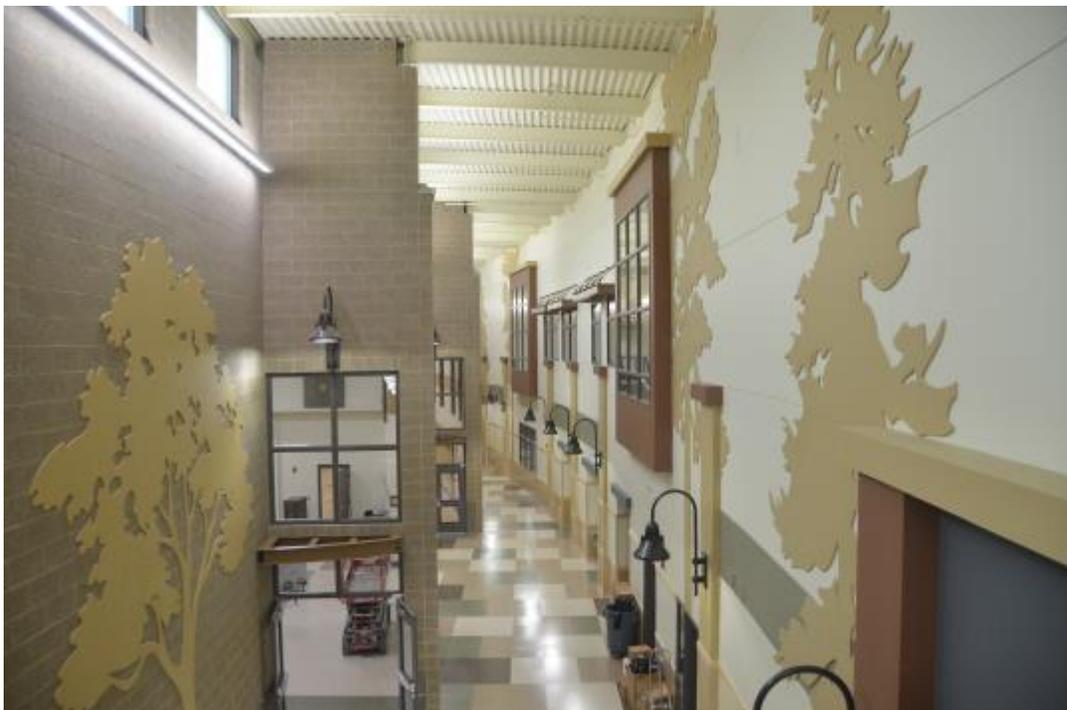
Looking West Along First Floor of 2015 Addition From Second Floor
